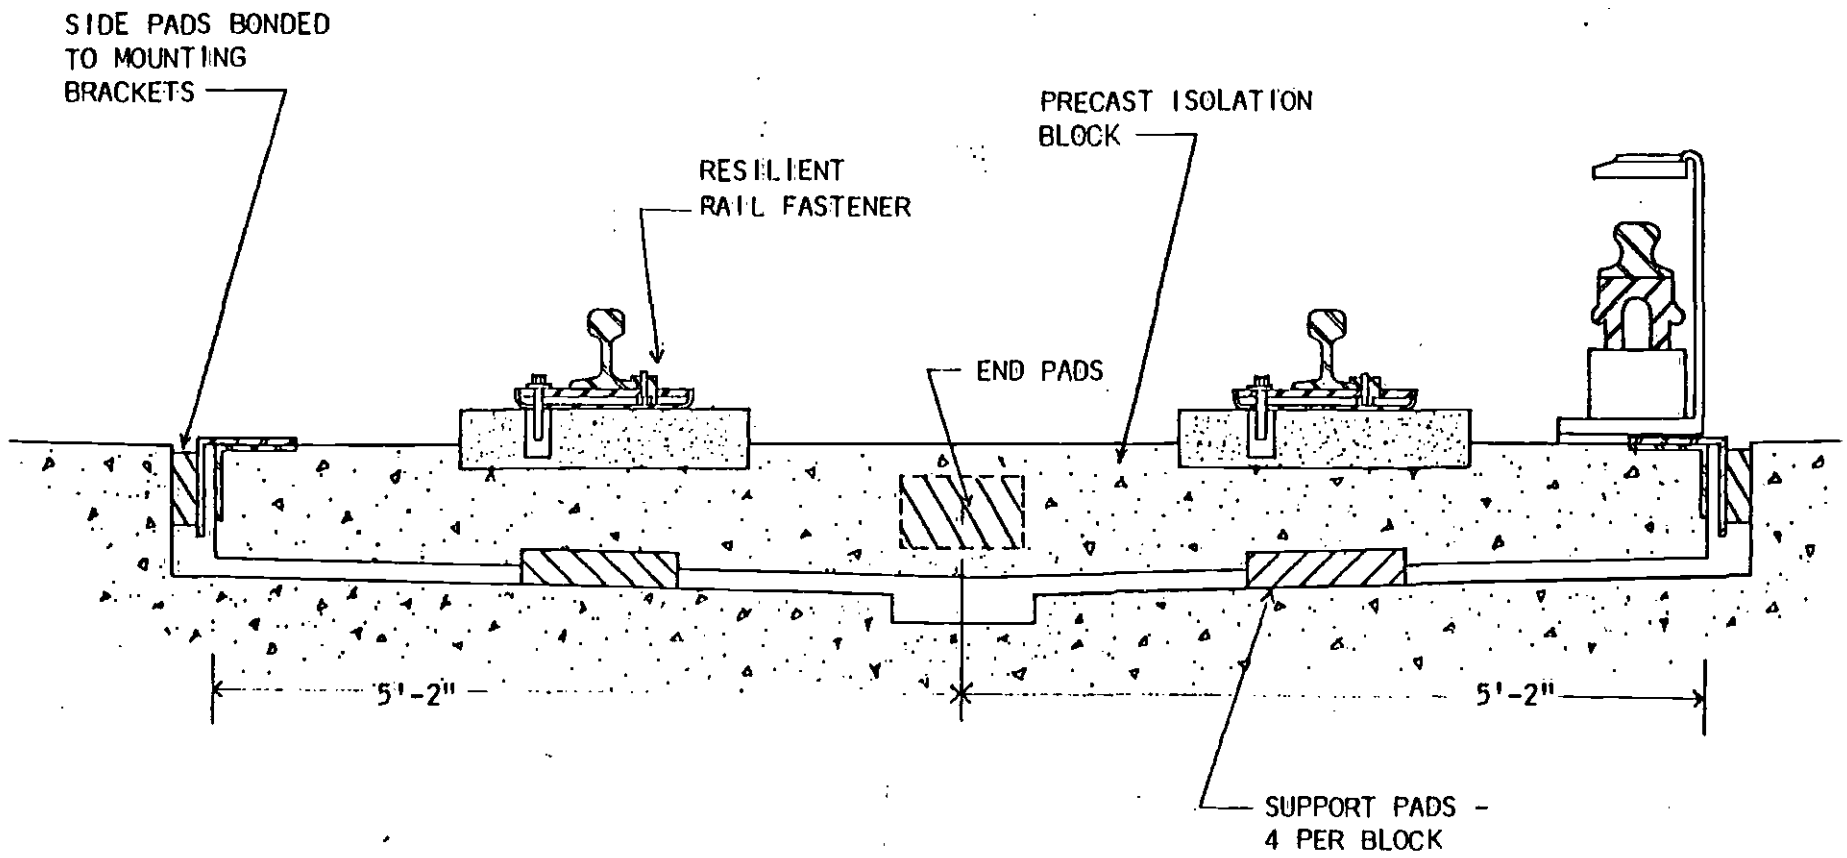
CROSS-SECTION OF THE DISCONTINUOUS FLOATING SLAB TRACK SUPPORT SYSTEM USED AT THE MARTA SYSTEM
